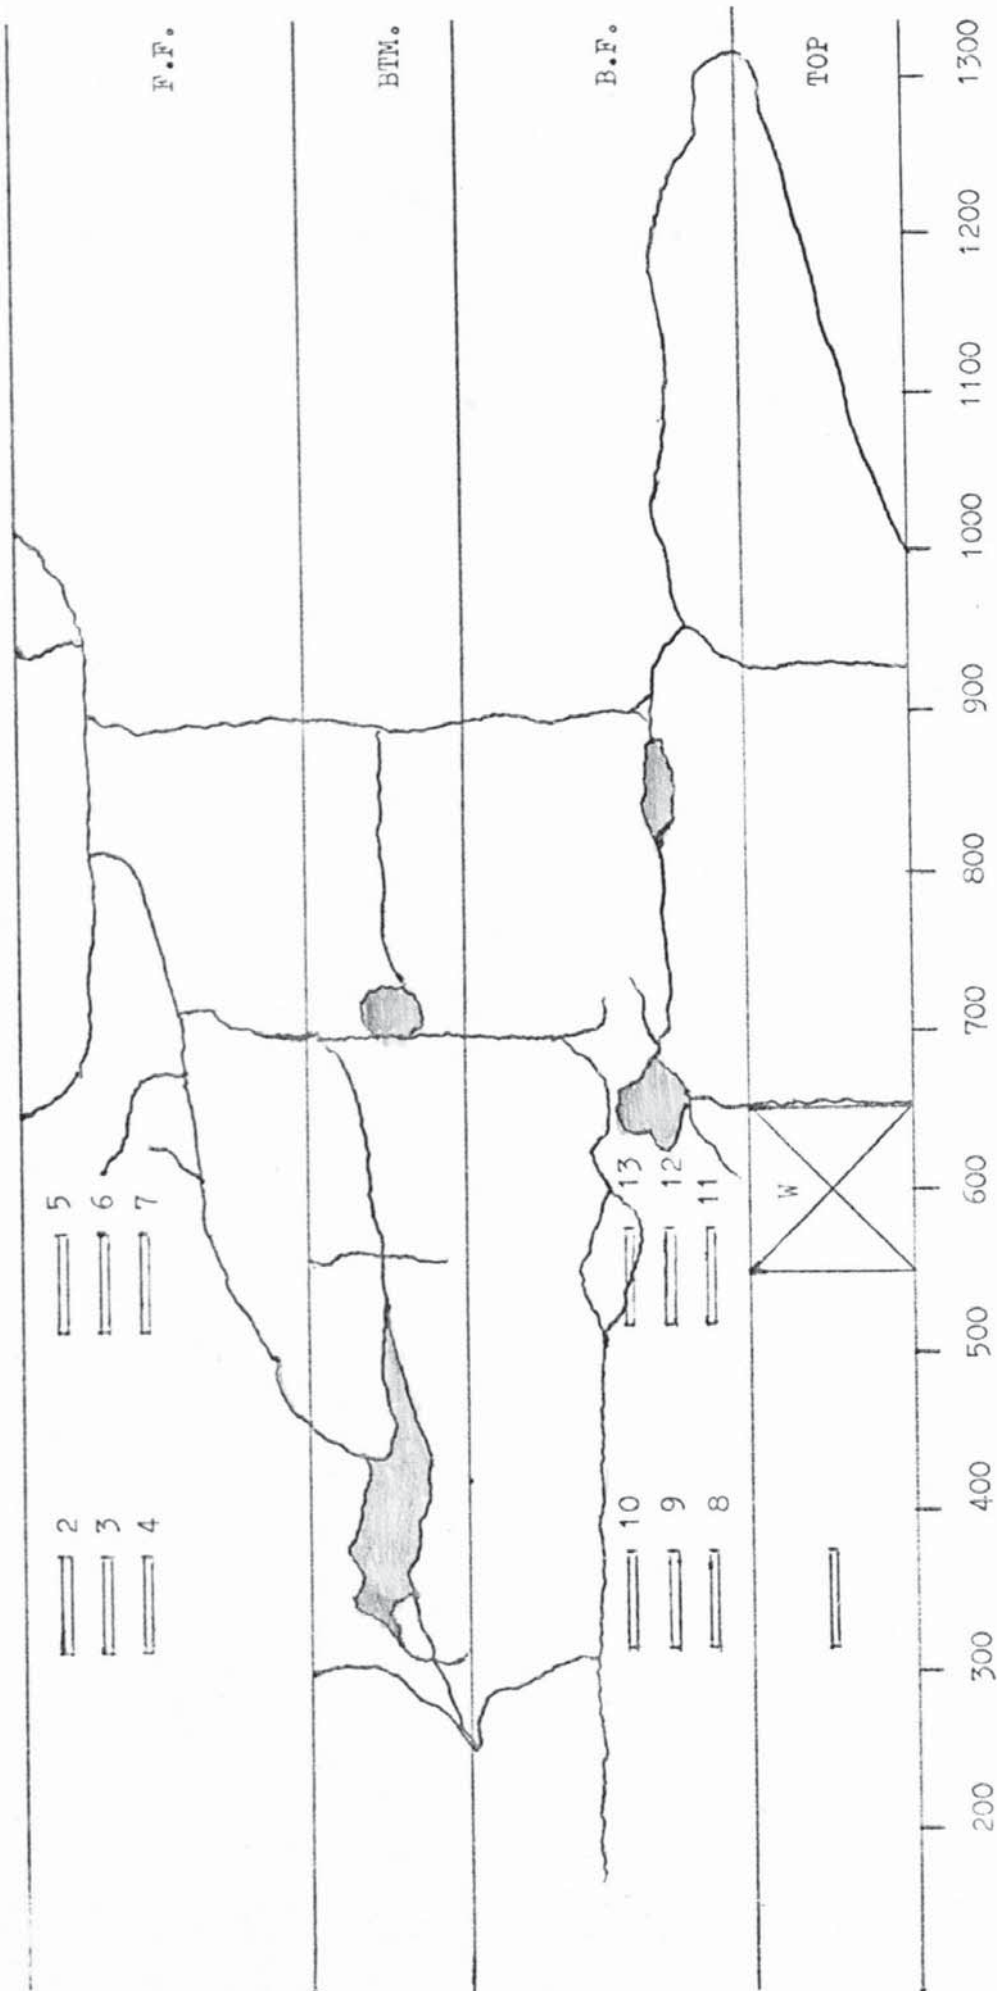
FAILURE CRACK PATTERNS - BEAM 1 (MODE 2)
